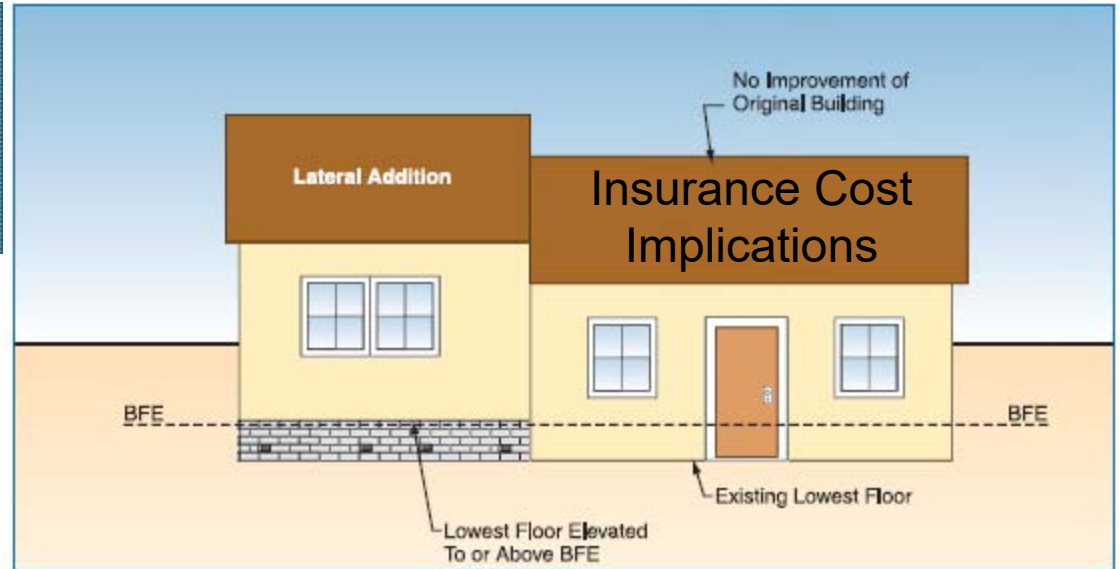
Lateral addition to a pre-FIRM building in an A zone – the proposed work is only the addition (no work was performed on the original building and no structural modification was made to the common wall or roof). The addition constitutes a substantial improvement and it complies with all NFIP requirements.
